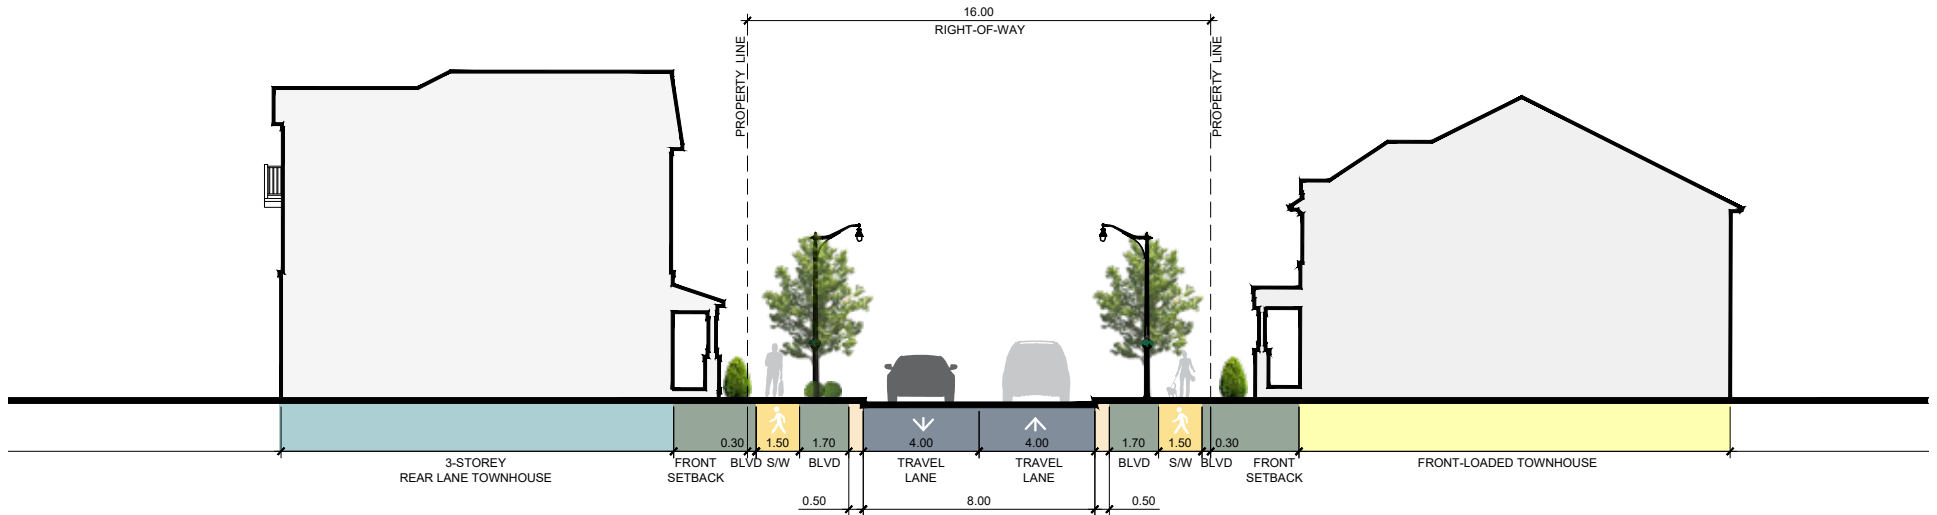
16.0m Local ROW Cross Section (sidewalk on both sides)
